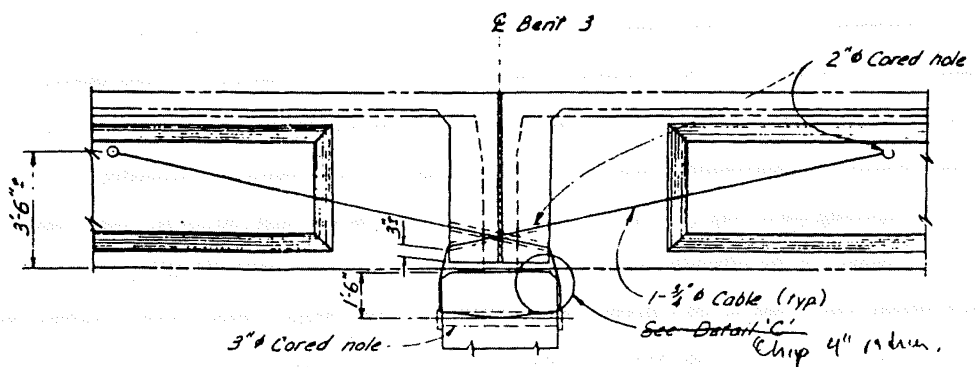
Retrofit plan for the movement joints of a concrete box girder bridge using cable restrainers and steel pipe seat extenders [Zelinski pers. comm. 1993].
